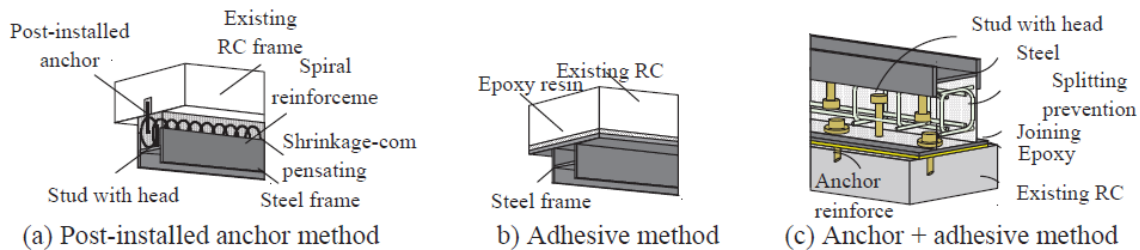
Joints between steel brace and RC frame (Ishimura et al. 2012)
